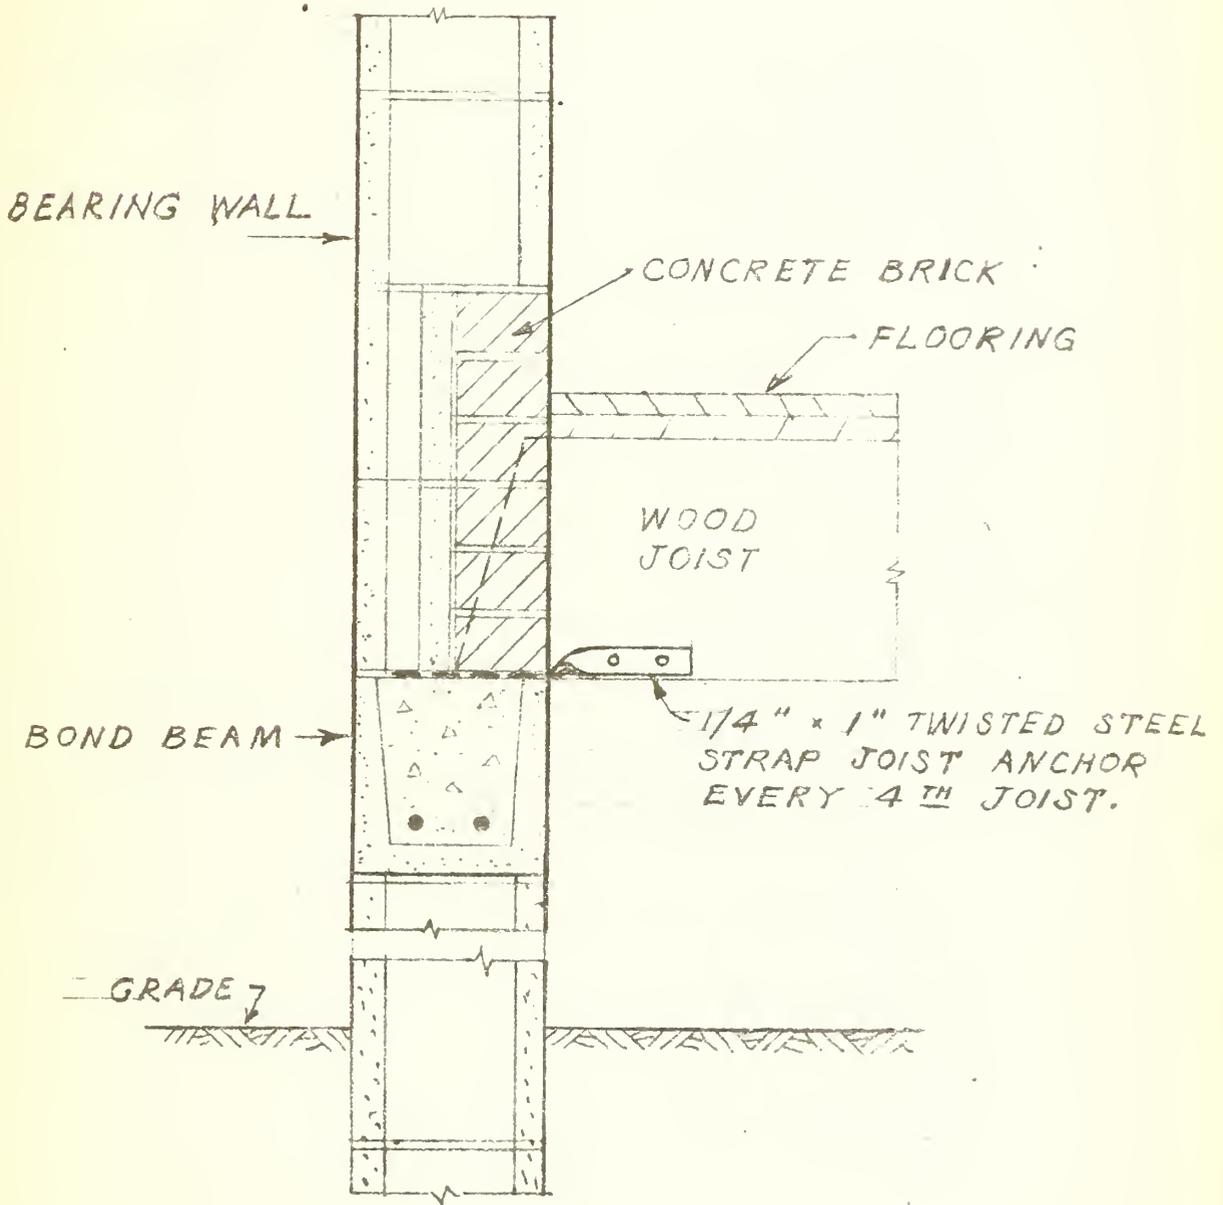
TYPICAL WALL SECTION AT WOOD JOIST FLOOR
